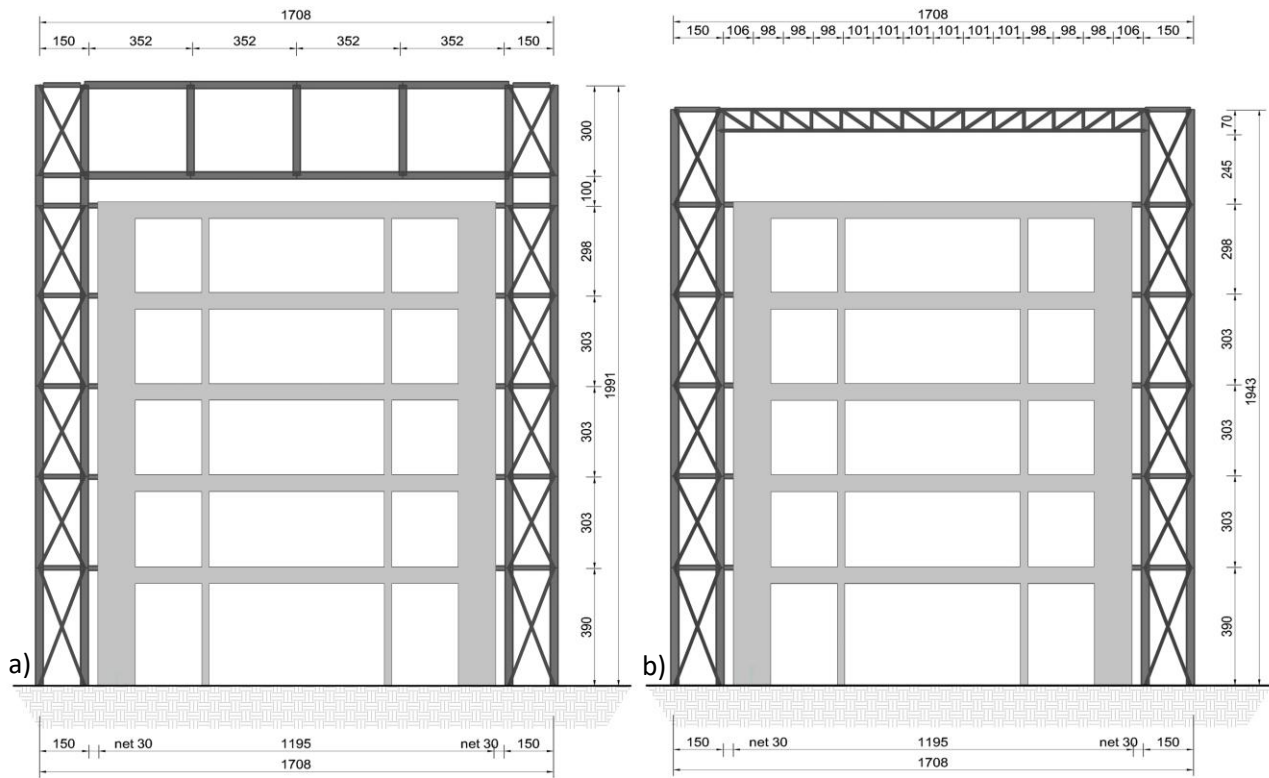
Elevation schemes of the roof-extension solutions of the exoskeleton (cm as units); a) Vierendeel beam; b) truss beam
